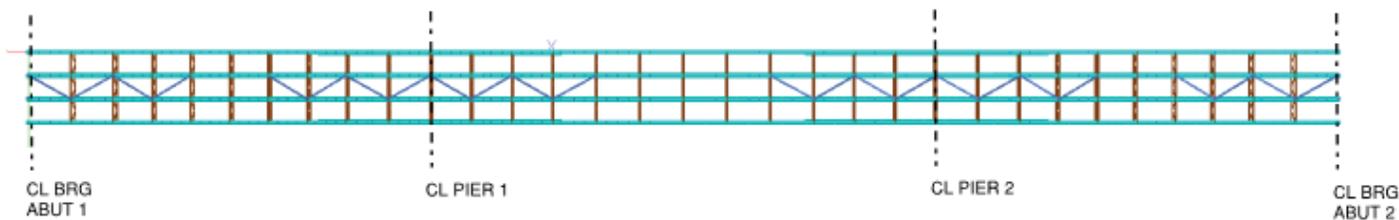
Steel Framing Plan with Additional Lateral Bracing to Assist in Girder Erection
